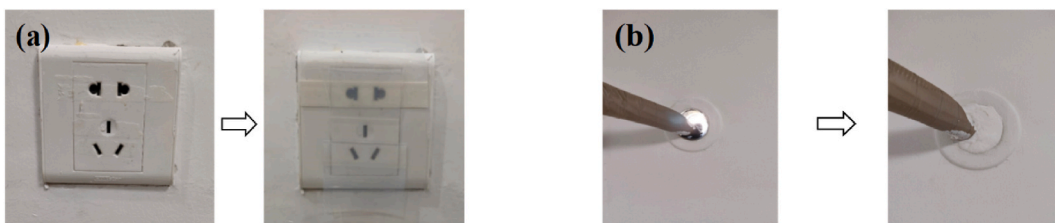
Sealing measures in the tested spaces: (a) Socket sealing, and (b) Pipe hole filling.
